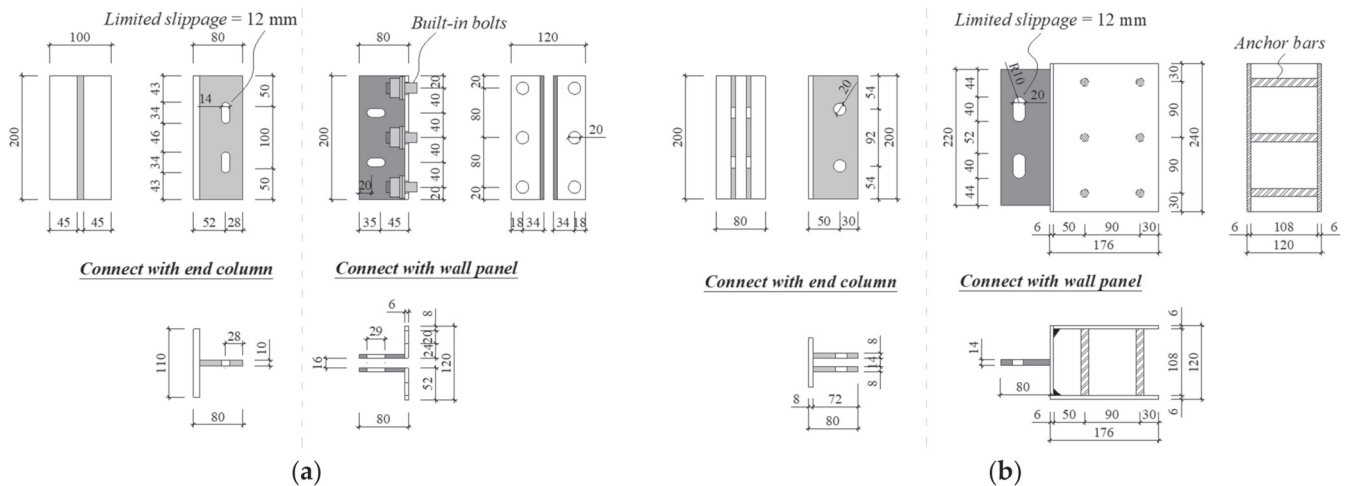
Details of vertical connection in PC walls (unit: mm). (a) W1-R; (b) W2-R.
